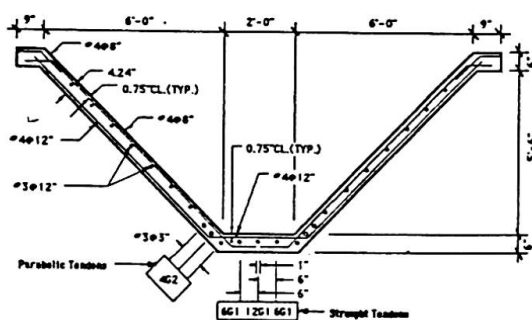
Cross-Section of the Model with Reinforcements (1 in = 25.4 mm)
